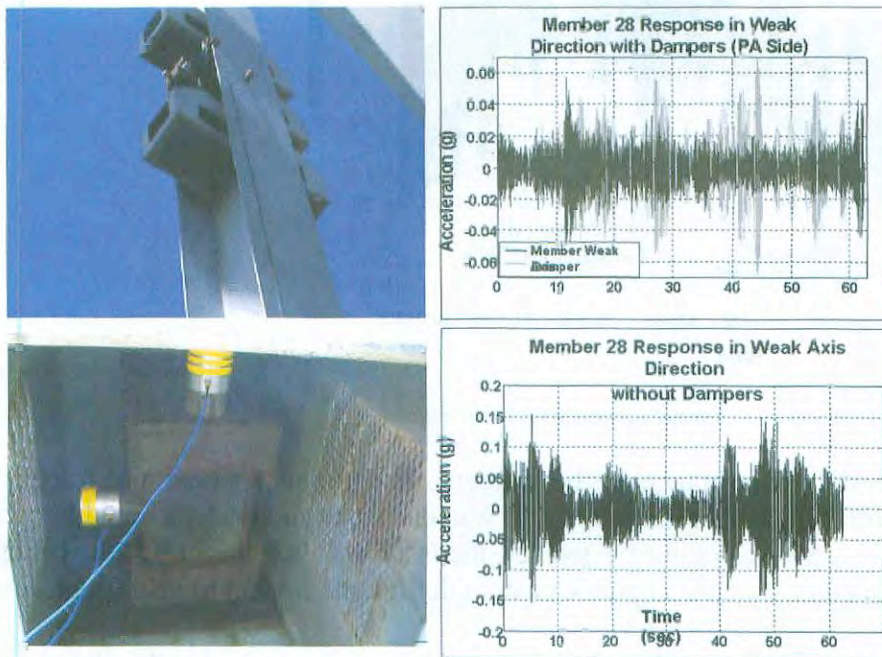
Monitoring truss members with and without the vibration dampers
